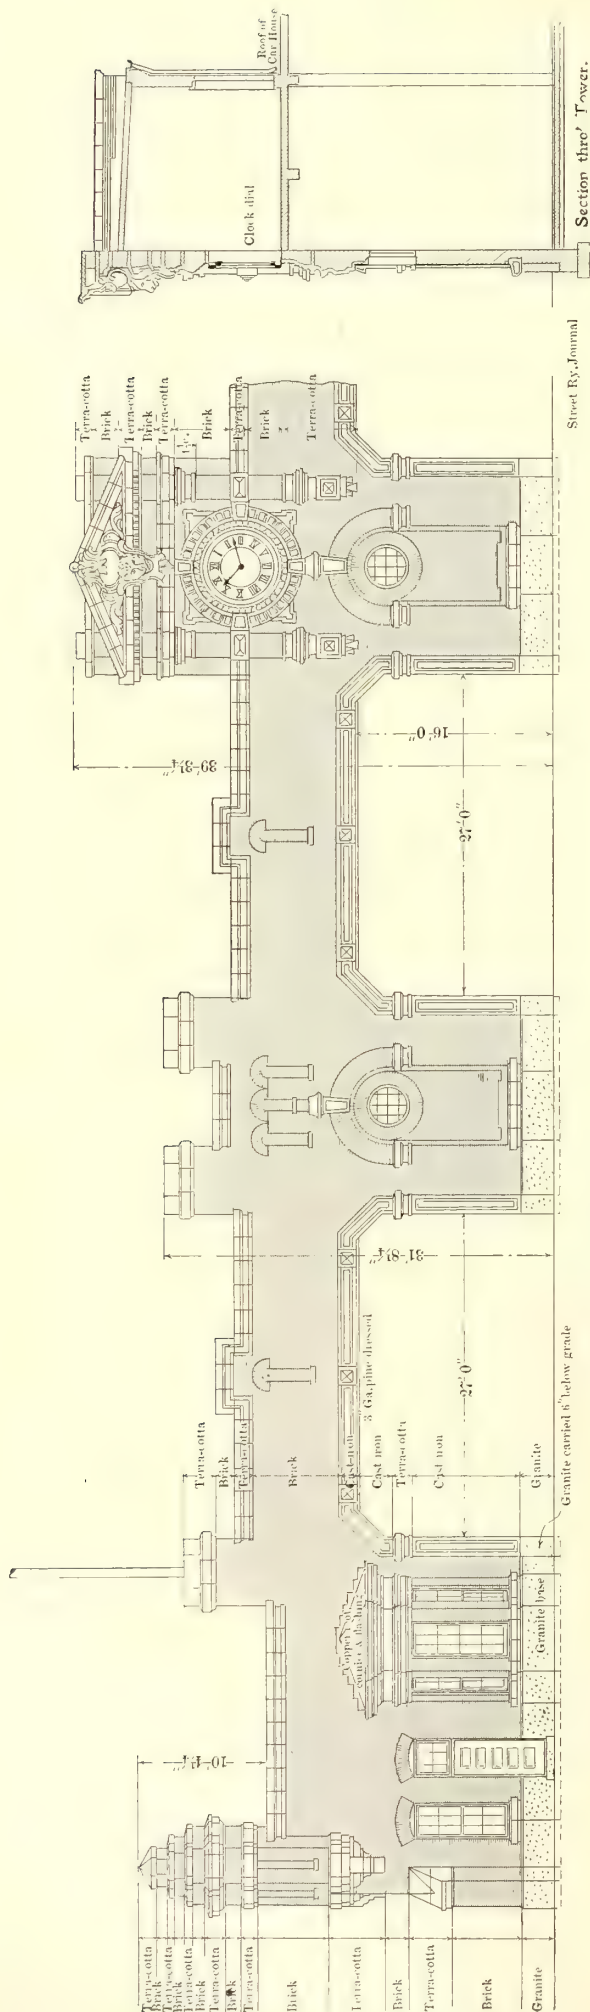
FRONT ELEVATION OF ELECTRIC PARK CAR HOUSE
